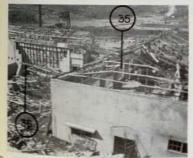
4,200 feet from GZ. Group 4. Building 23, PHOTO 49.—3,900 feet from GZ. Group 4. Building 28, first floor looking west.
